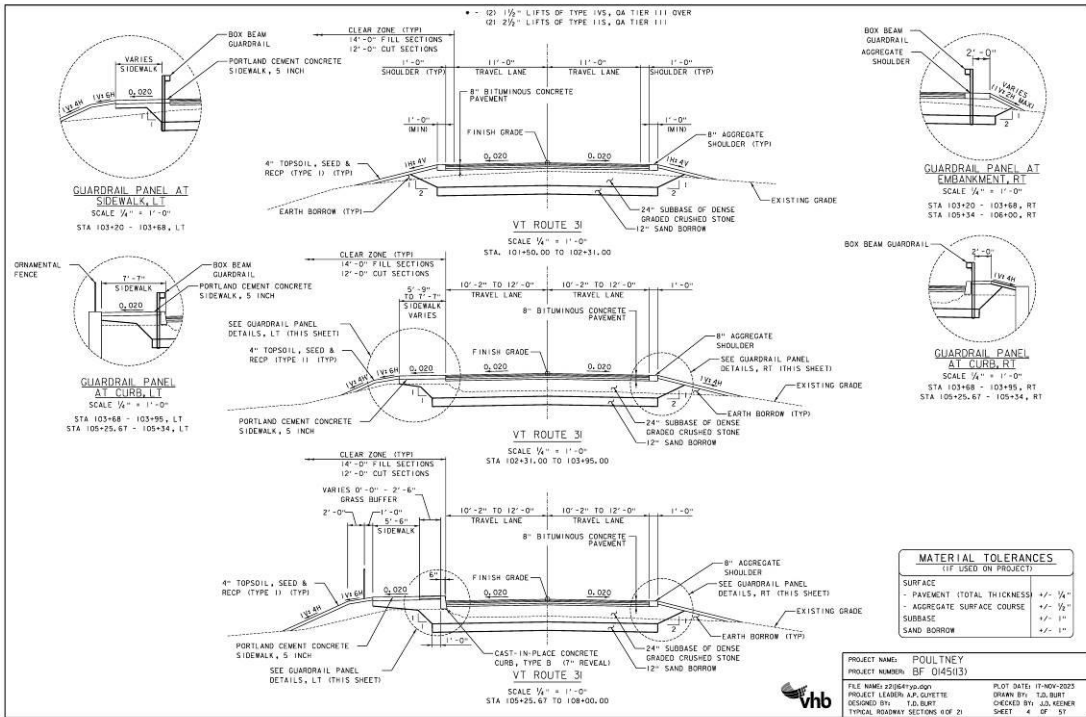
Typical Roadway Section 1 of 2, Sheet 4 of 57, Preliminary Plans, November 2023.
